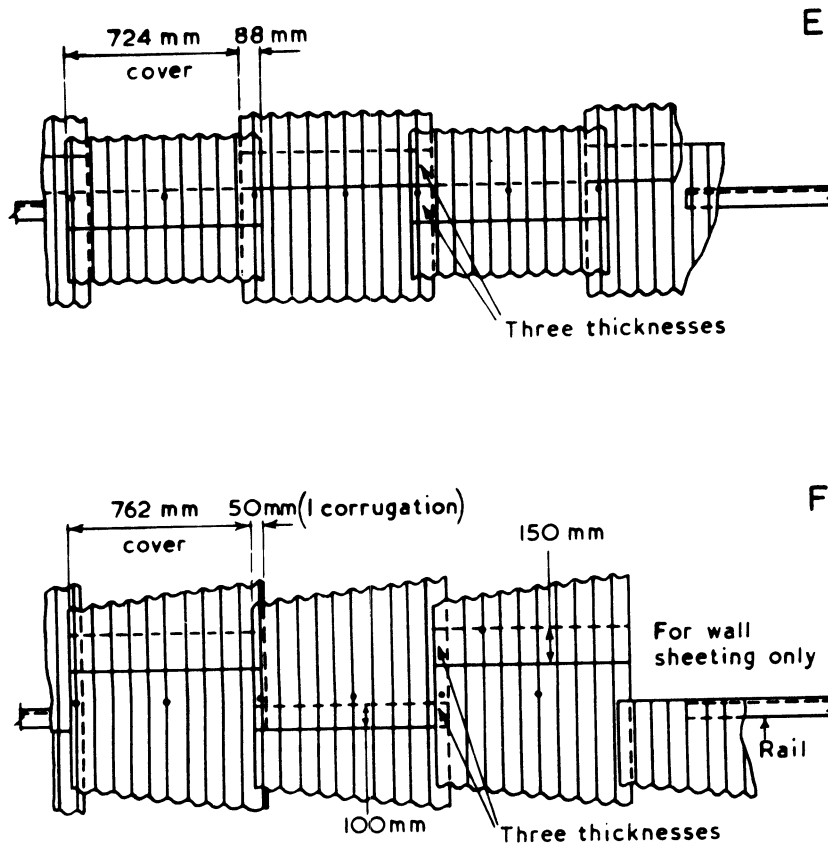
Typical layouts and end laps of 10/76.2 mm corrugated steel sheeting (concluded)
